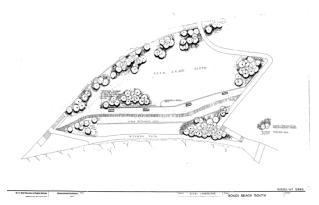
PWD revised plan, 1979. Source: WLS Engineers Plan 3665
